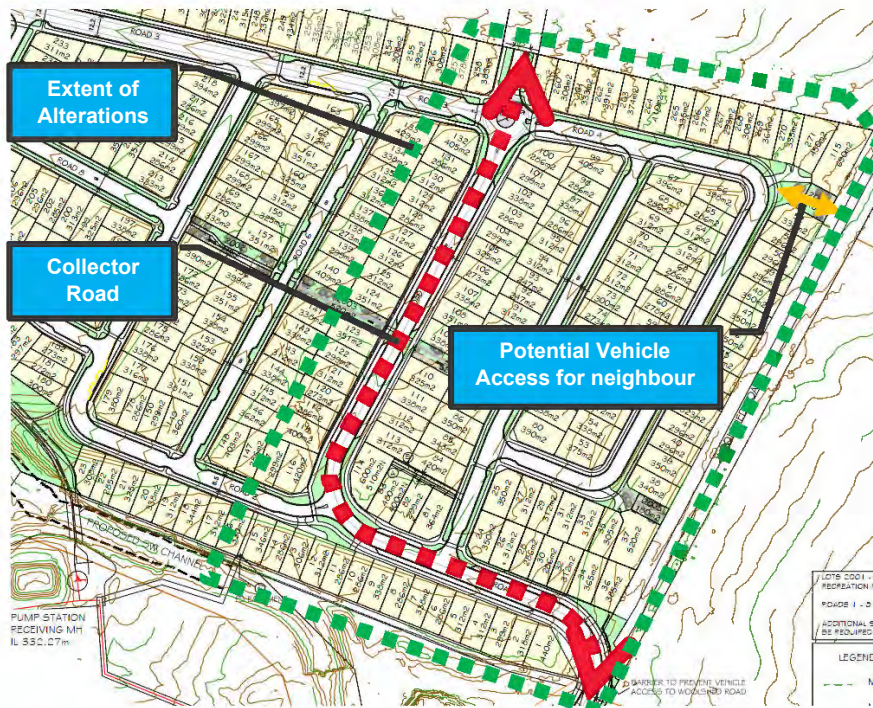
Proposed 90 Bend for the Collector Road Before Linking to a Roundabout
